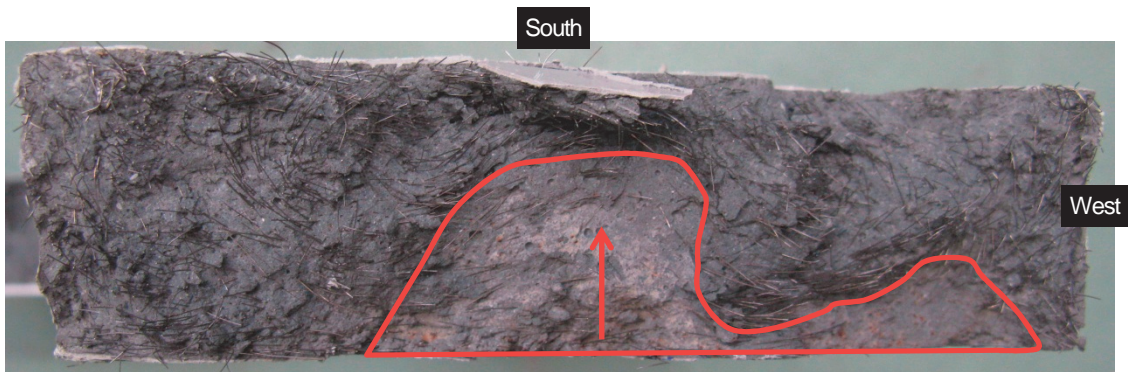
Fatigue fracture surface of S1-4 test specimen (lower half of the fractured specimen)
